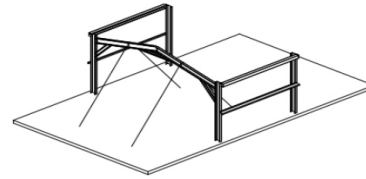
Frame First Temporary Bracing on First Rafter Installed
